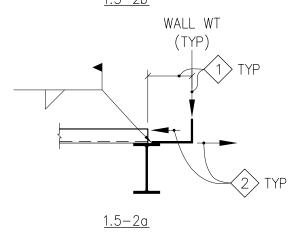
STRUCTURAL STEEL ENGINEERING ISSUES - FLOOR
